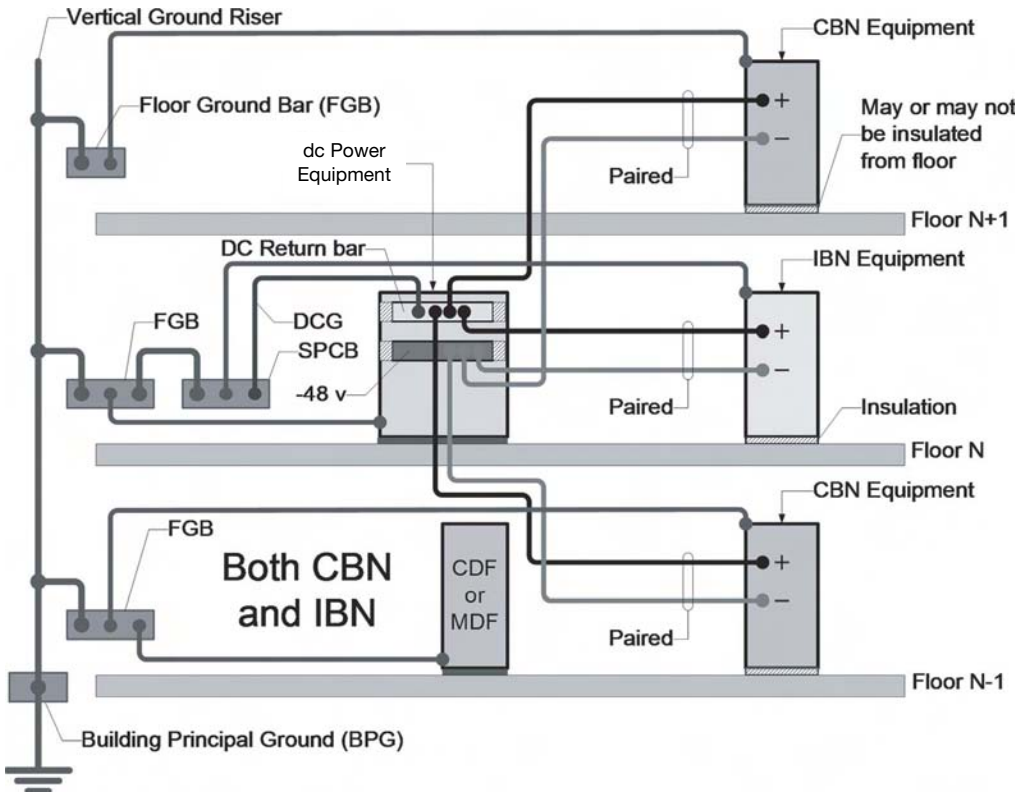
Bonding a mixture of IBN and CBN equipment.
